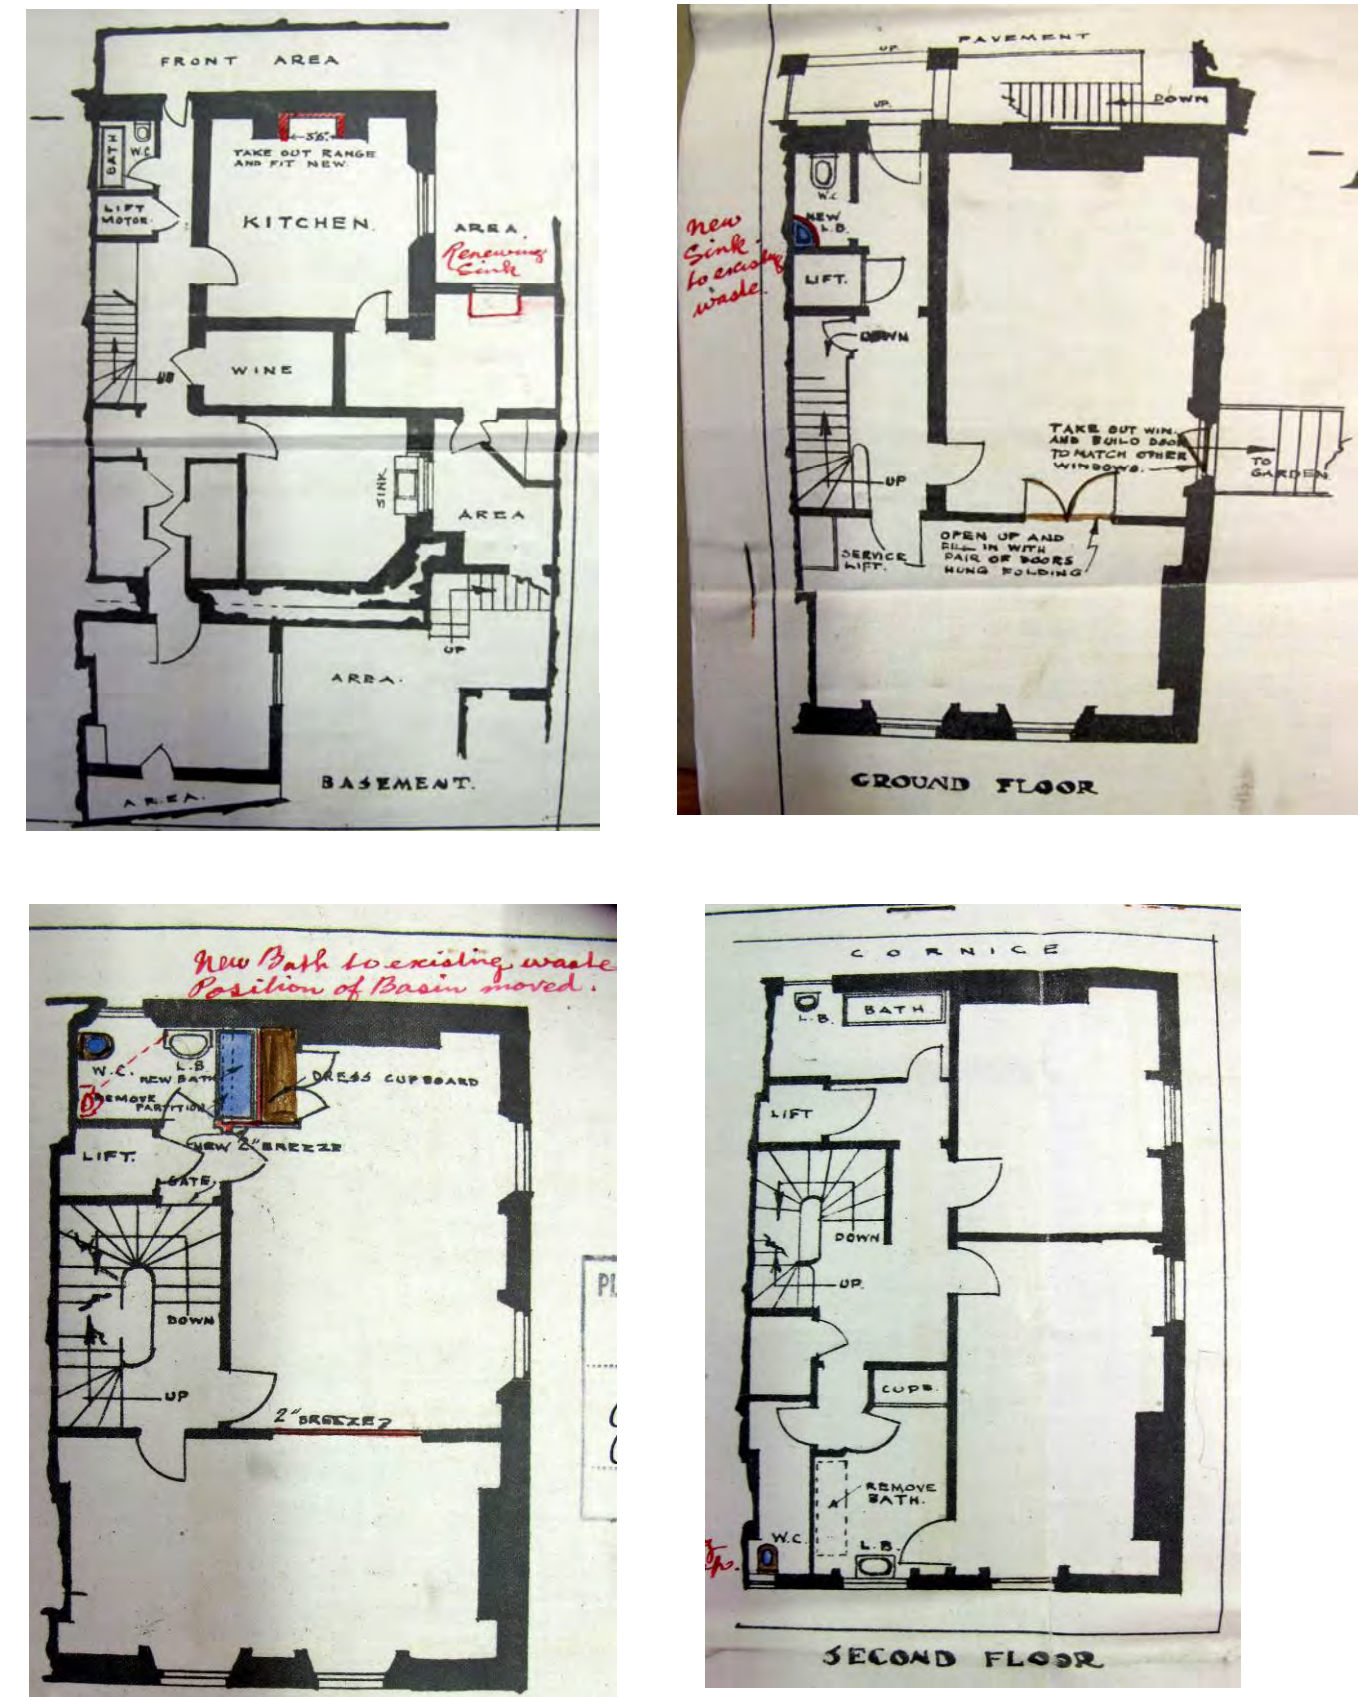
1932 drawing showing changes proposed in the basement and ground floor. There is a proposed opening between front and rear room on the ground floor, as well as the window being replaced with a new door.
